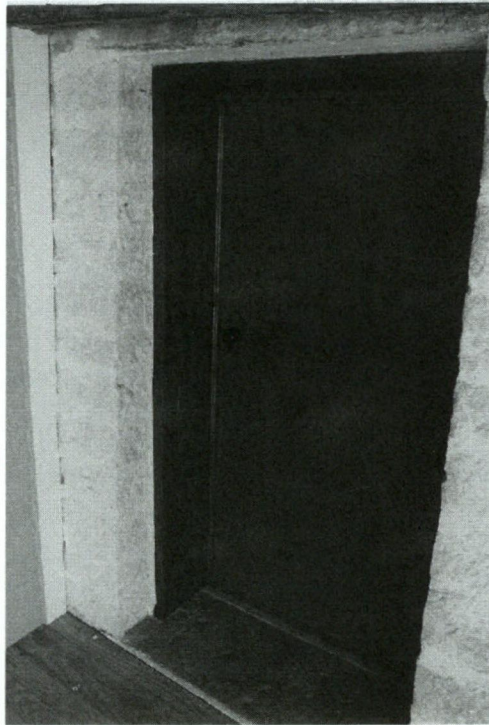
Black walnut door frame, west entrance to kitchen. *Courtesy Amy and Randall Walton.
